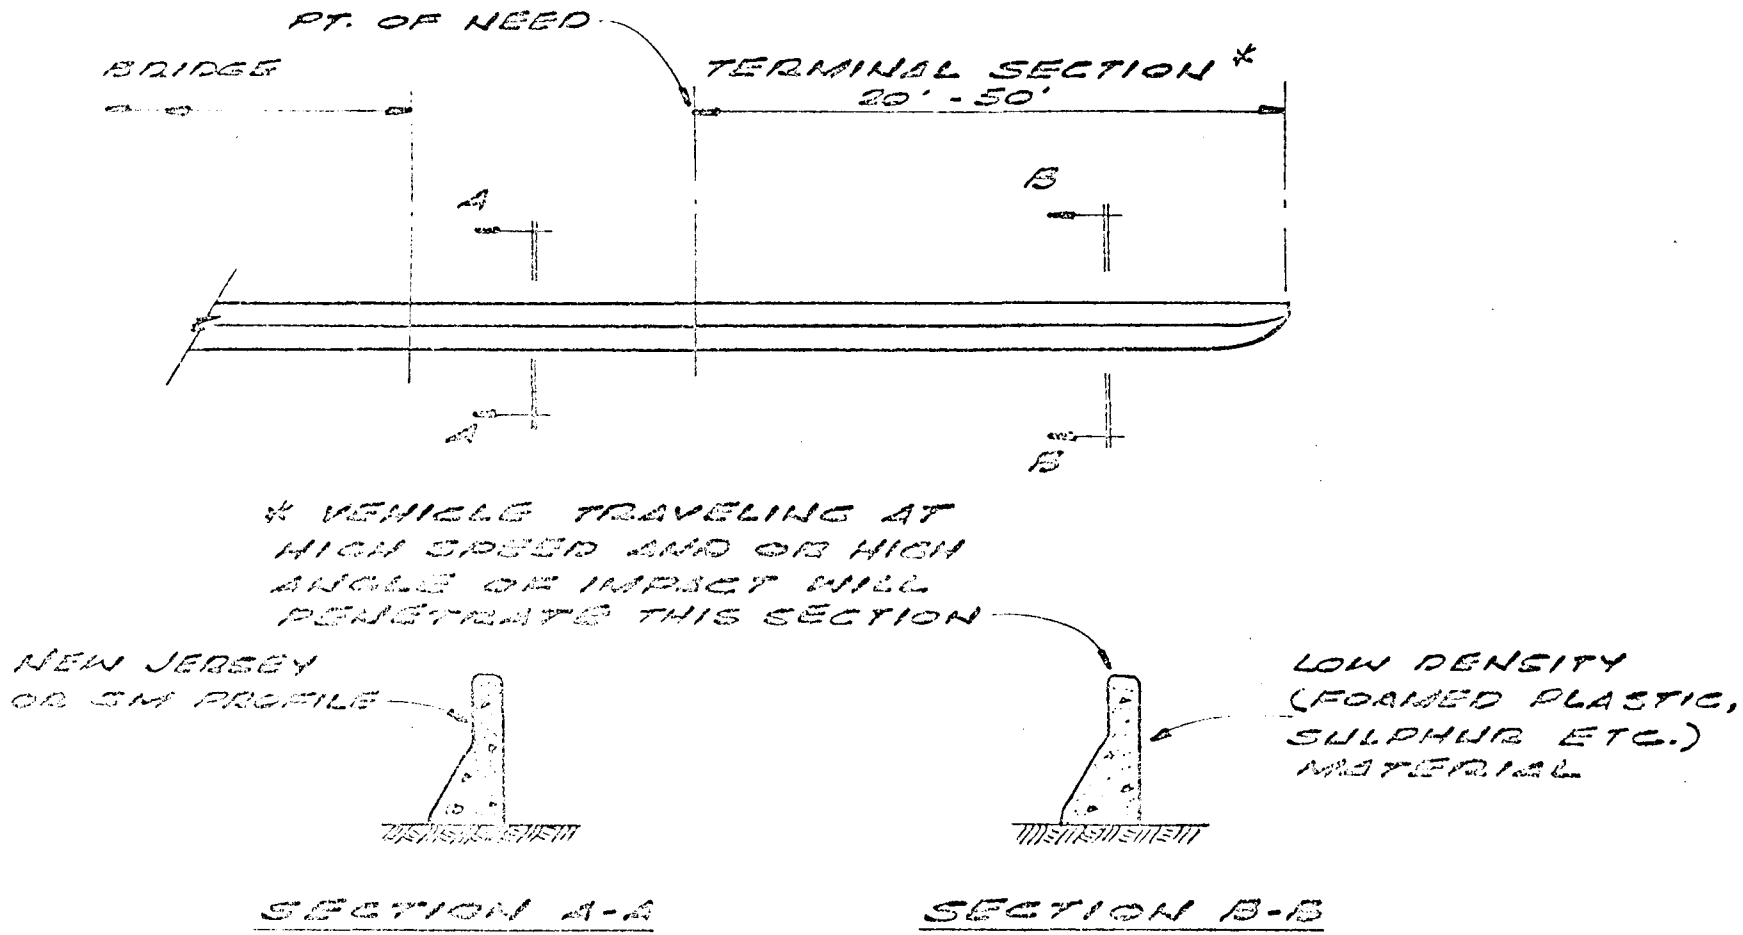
CONCRETE BARRIER END TREATMENT: CONCEPT B
